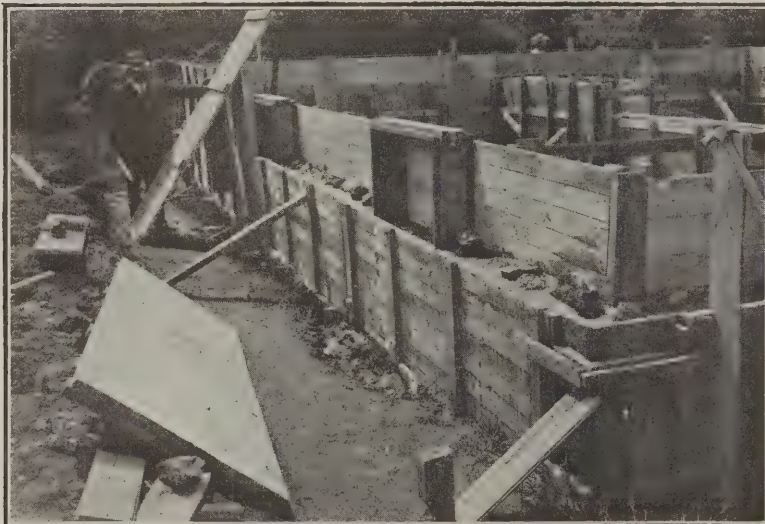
Sectional "Form" for Concrete Wall Construction
